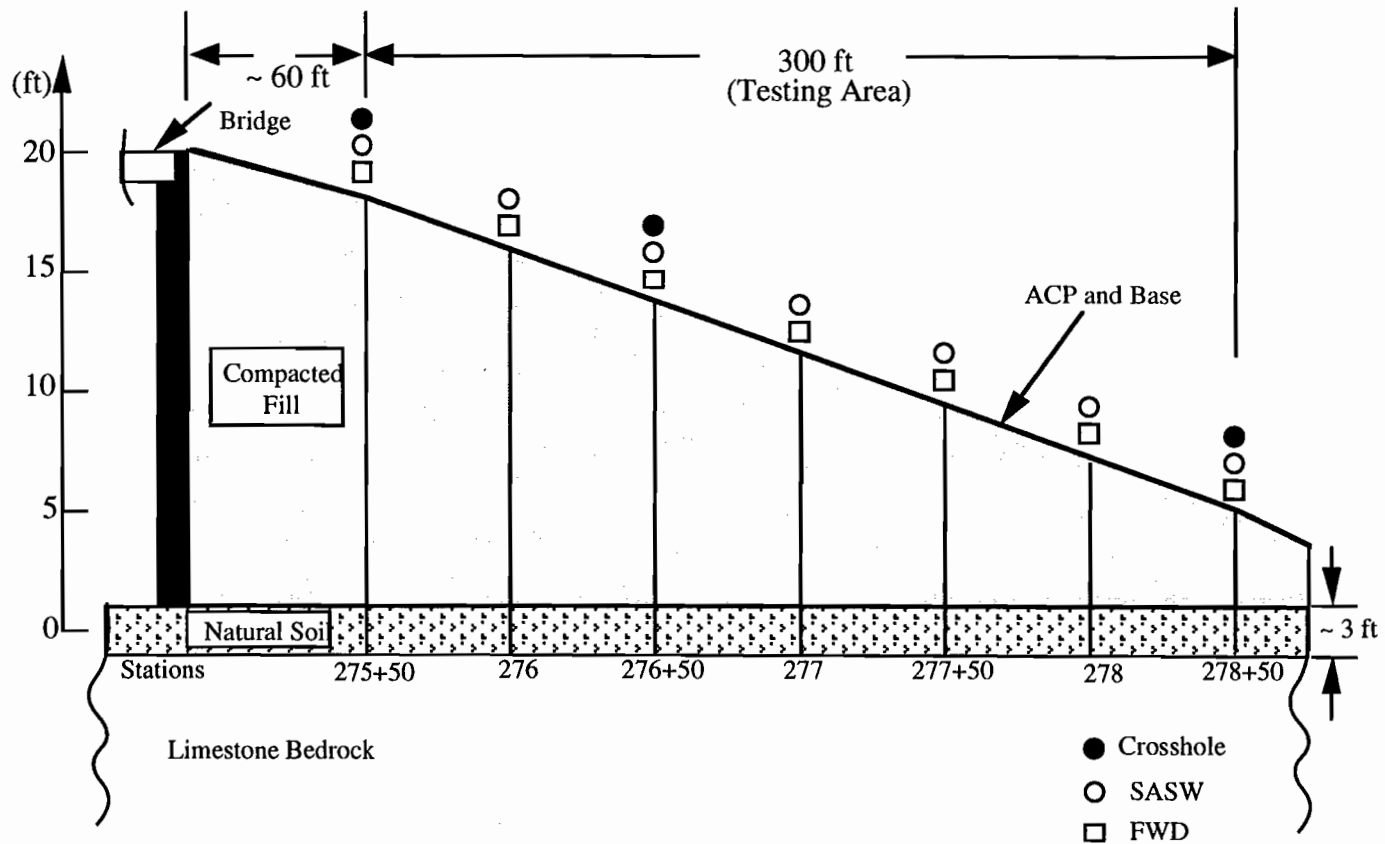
Approximate Longitudinal Cross-Section of Embankment SW
